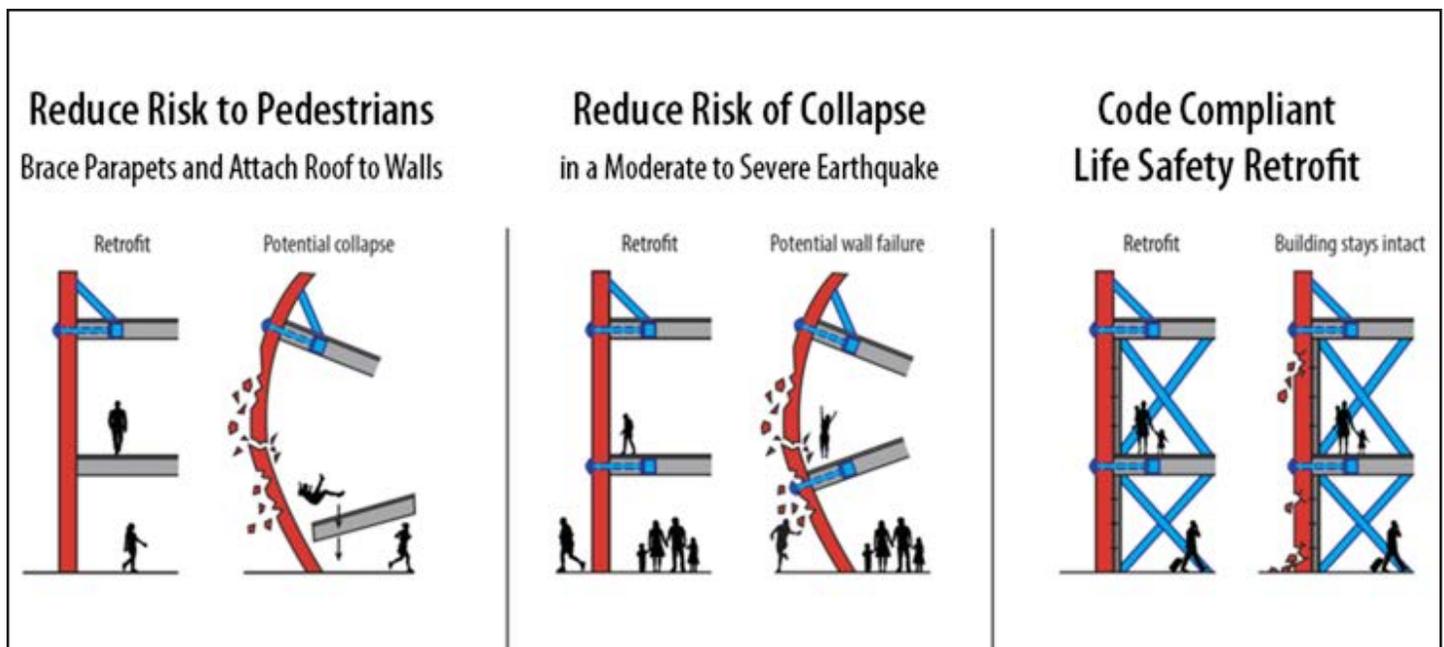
Illustration of the risks posed by existing buildings, particularly unreinforced masonry (URM) buildings. (Source: Portland Government)
